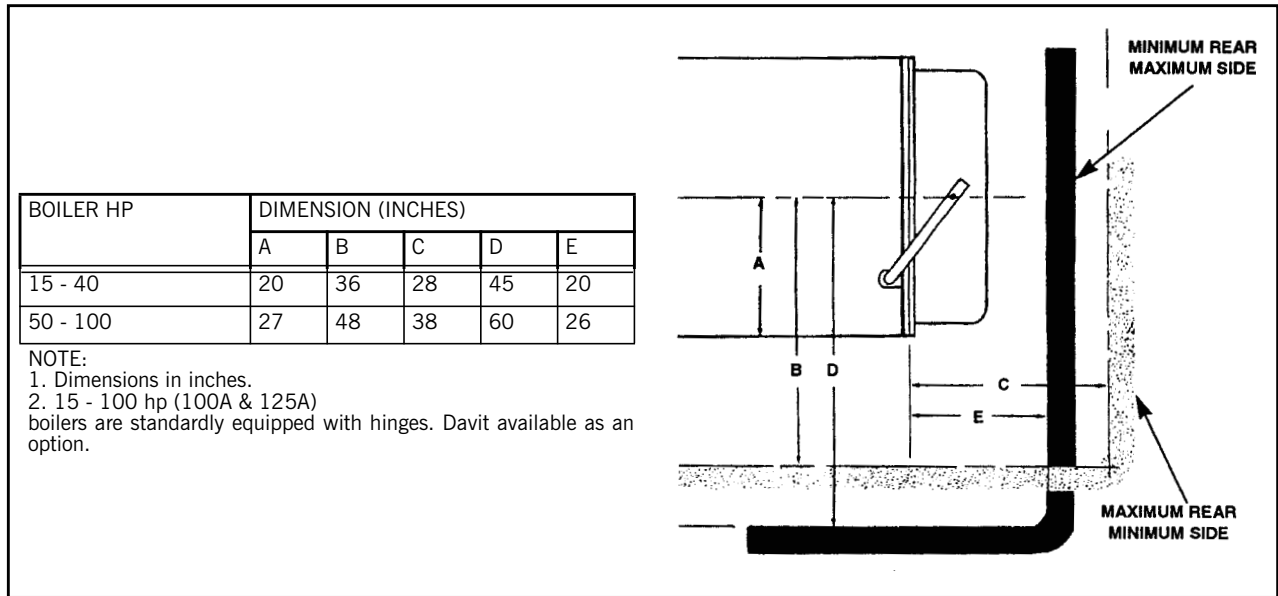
Space Required to Open Rear Head on Model CB Boilers Equipped with Davits
